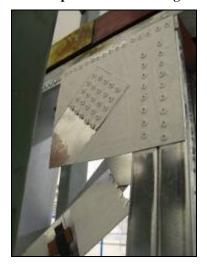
Compression and bearing failure of the bottom track of specimen 39A-M
